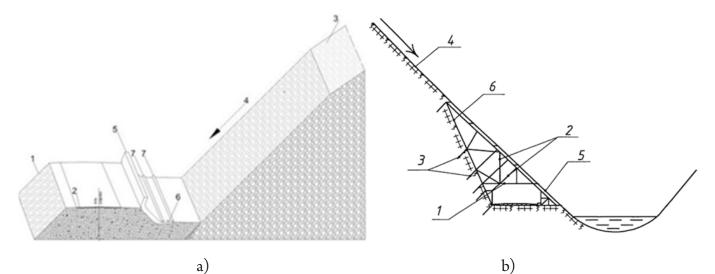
Patented avalanche-protection constructions: a) layout of the avalanche-accumulation excavation; b) scheme of the avalanche-protection triangle metal frame, with road clearance
